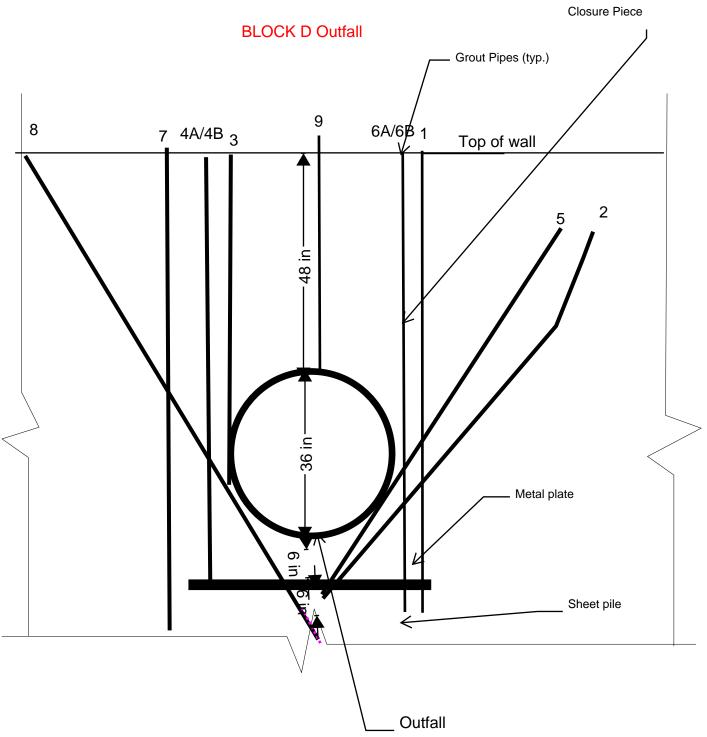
Profile View of Grout Pipe Location at OF-00X, Block D (view towards the land)
